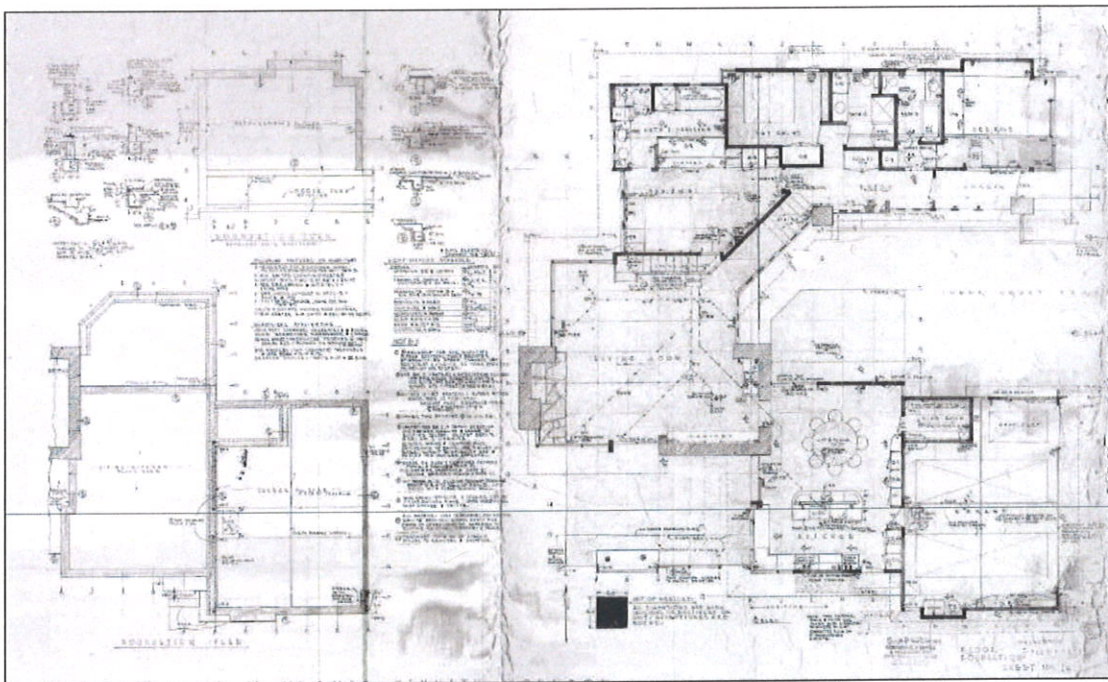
Floor plan for Mark Mills' 1984 remodel, showing additional wing at bottom right and converted garage at upper right.
